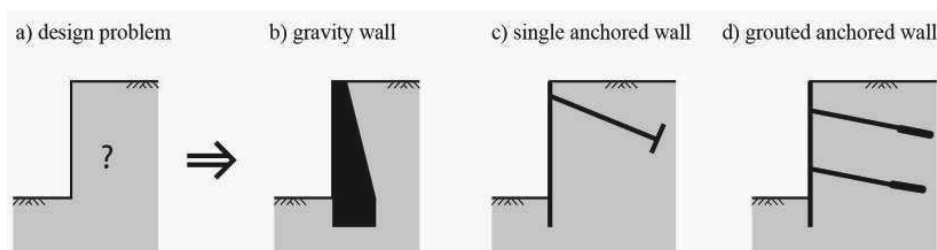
Different topologies for a design problem a): b) gravity wall, c) single anchored wall, d) grouted anchored wall
